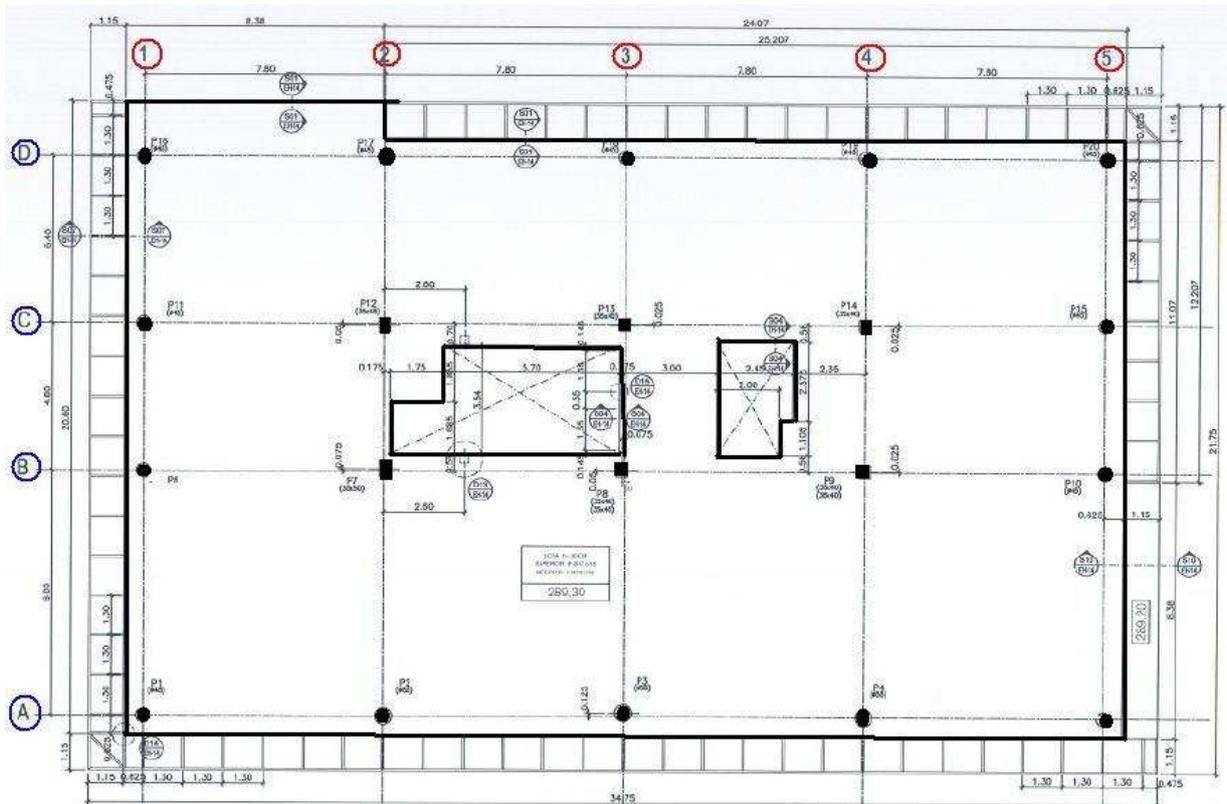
Slab configuration for ground floor and floors 1, 2 and 3 [18, 19]
